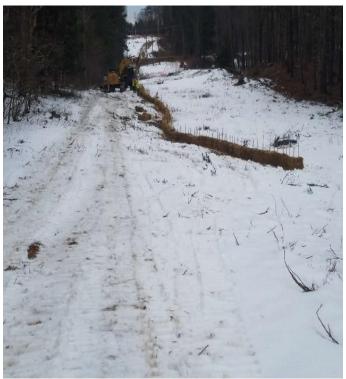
Crew installing BMPS along access road to Str. 61. Viewing west. (02-25-20).
